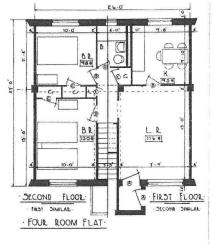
Flat Plan. *Unit Plans*, HD-42.
